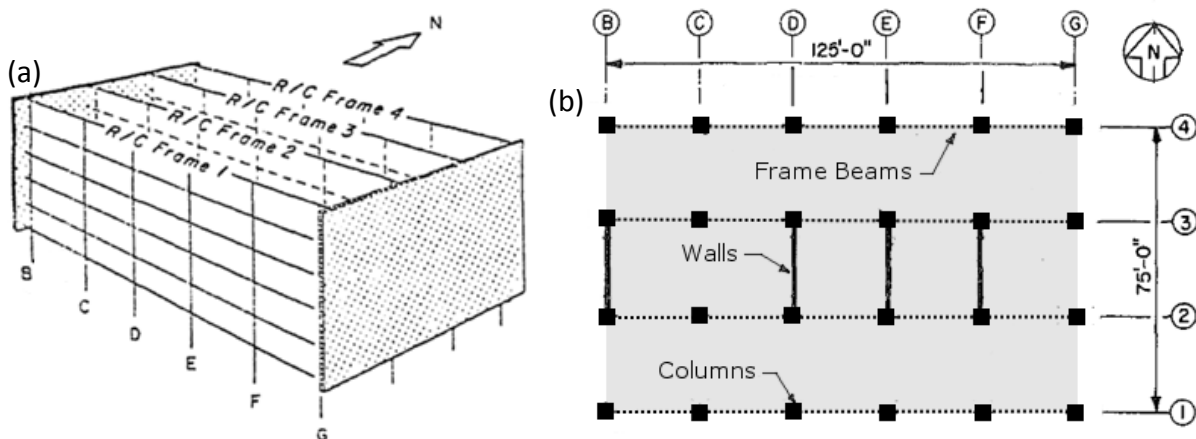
(a) Lateral force resisting system of the Imperial County Services Building, with 4 moment resisting frame lines in the E-W direction and discontinuous shear walls in the N-S direction; (b) Plan view showing the structural components in the first-story (figures are modified from original diagrams [13,14]).
